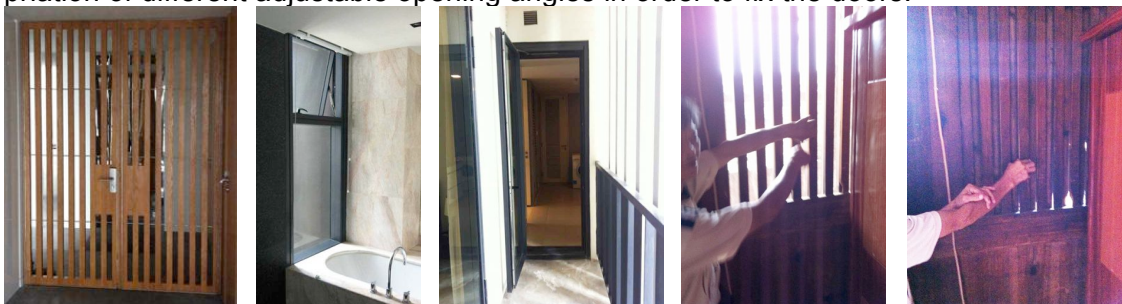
a) Porous Unit Entrance Door the MET, b) Top Hung Window the MET, c) Loggia Door the MET, d) Opened Sliding Window, Tulou China, e) Closed Sliding Window, Tulou China;
